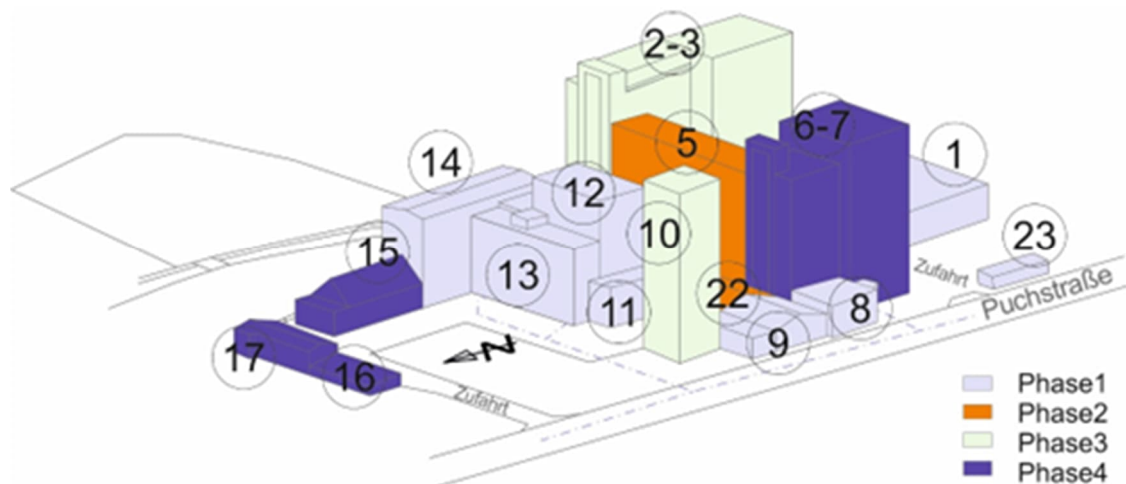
Whole building complex Tagger-Area and buildings related to refurbishment phases one to four (Source: BAR Vermögensverwaltung GmbH)
